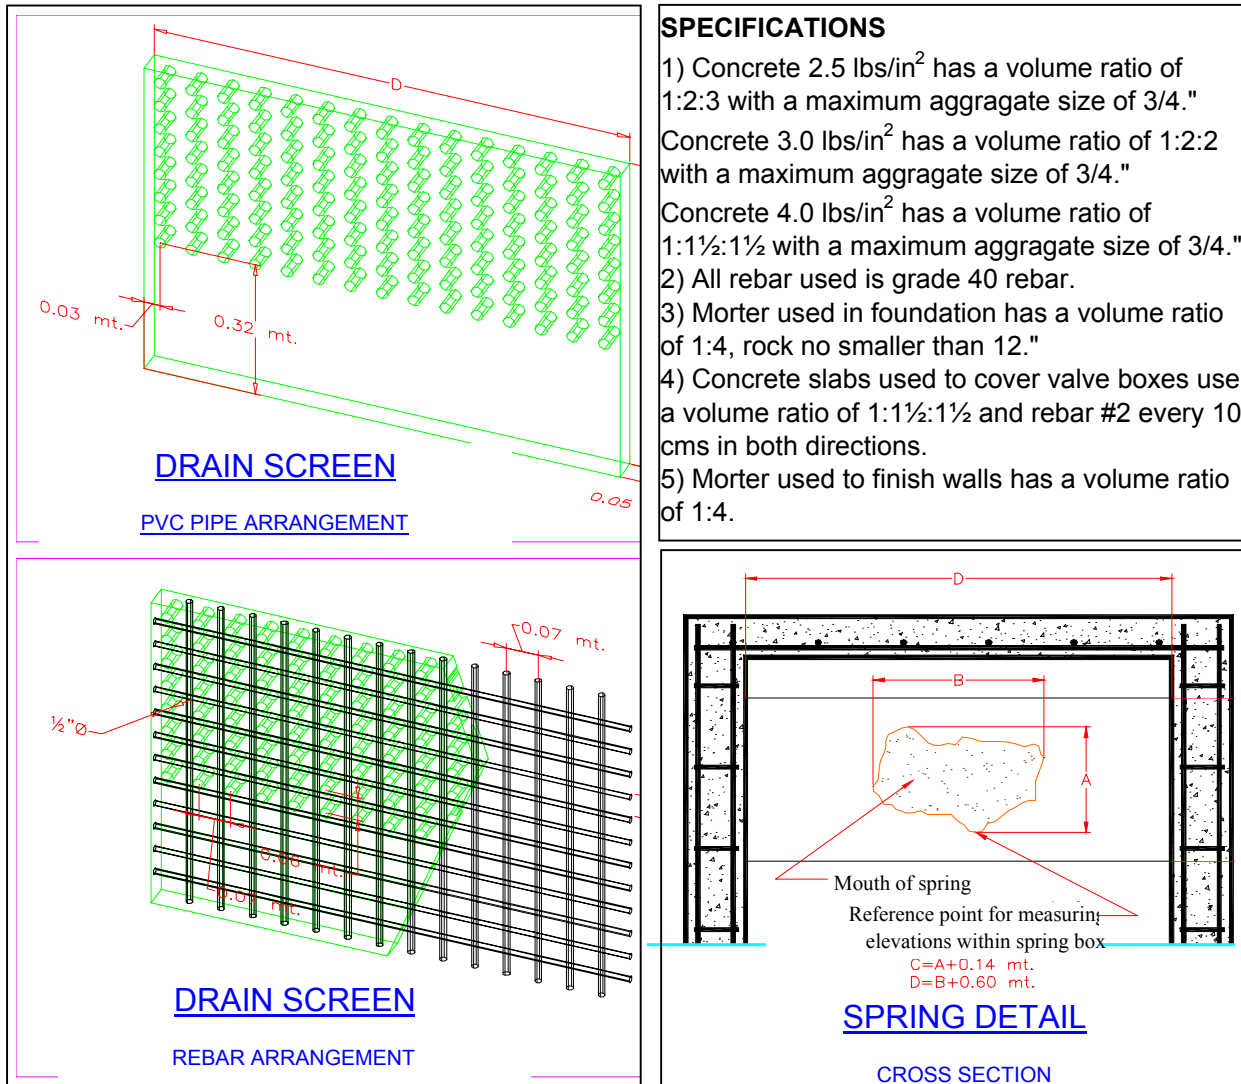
Profile view cross section of spring box with details on concrete beams and drain screen.
